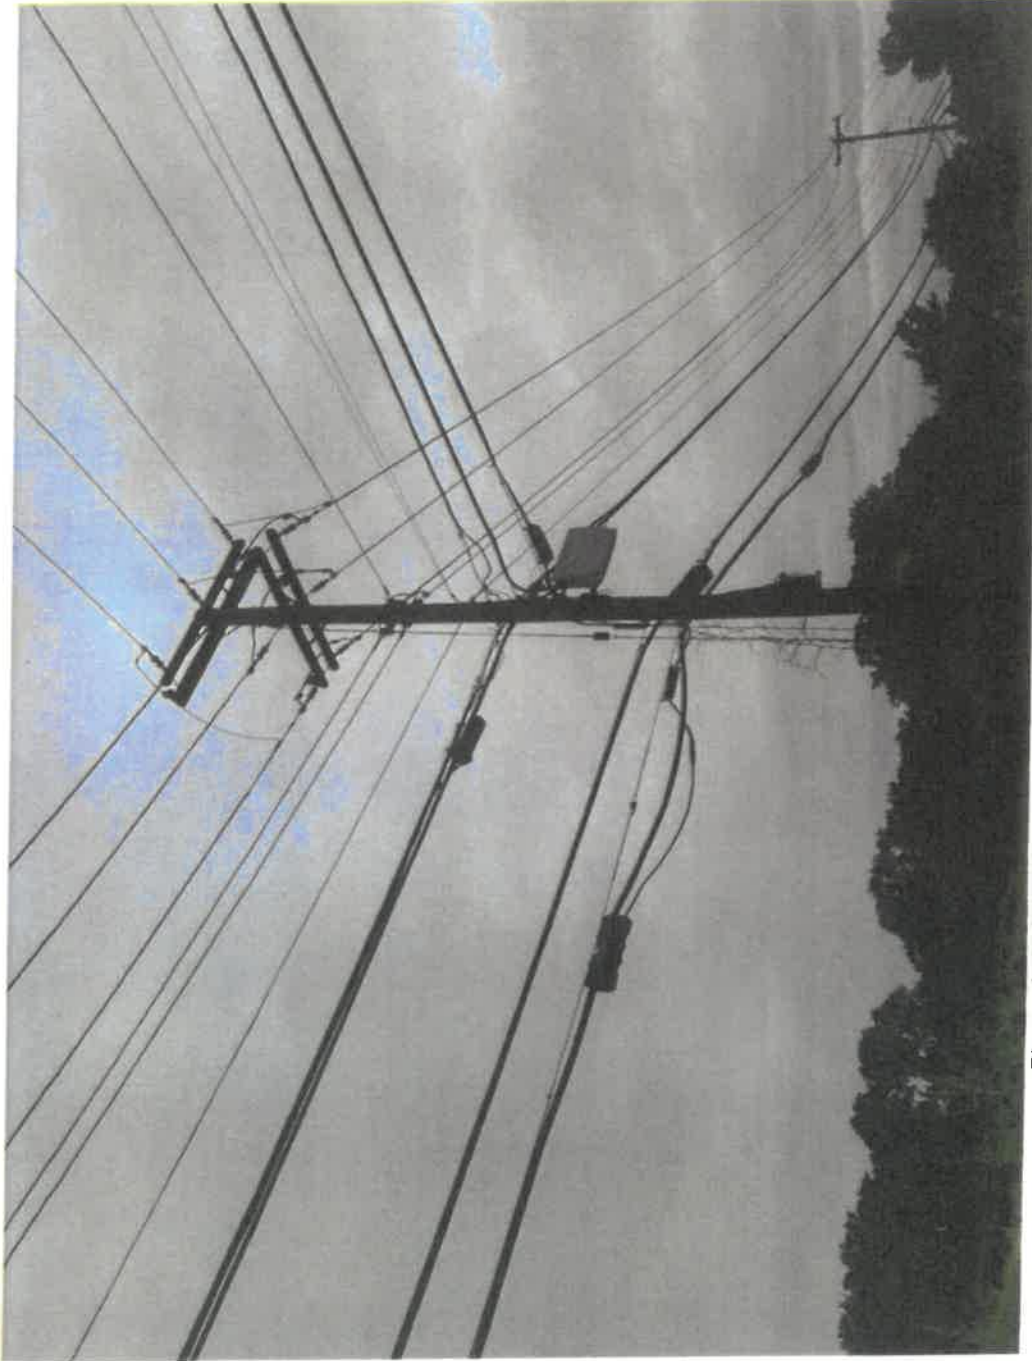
Existing Tap to Project Site on Clinton St (Looking West)
